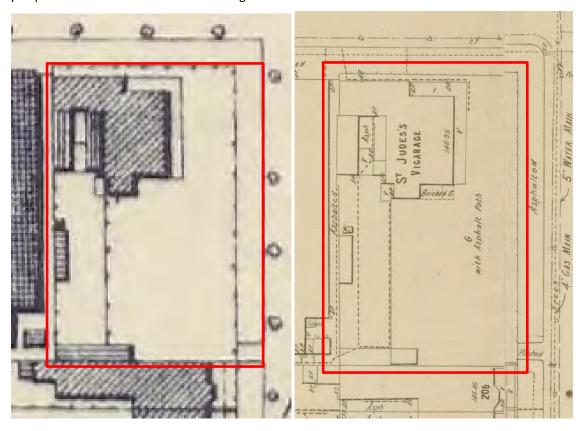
MMBW 160:1 plan no. 30, 1896 (left) and detail plan no. 1184, 1897 (right), showing brick vicarage and other timber buildings on subject site (indicated), 1896. North is at the top of the image, with Drummond Street at right
